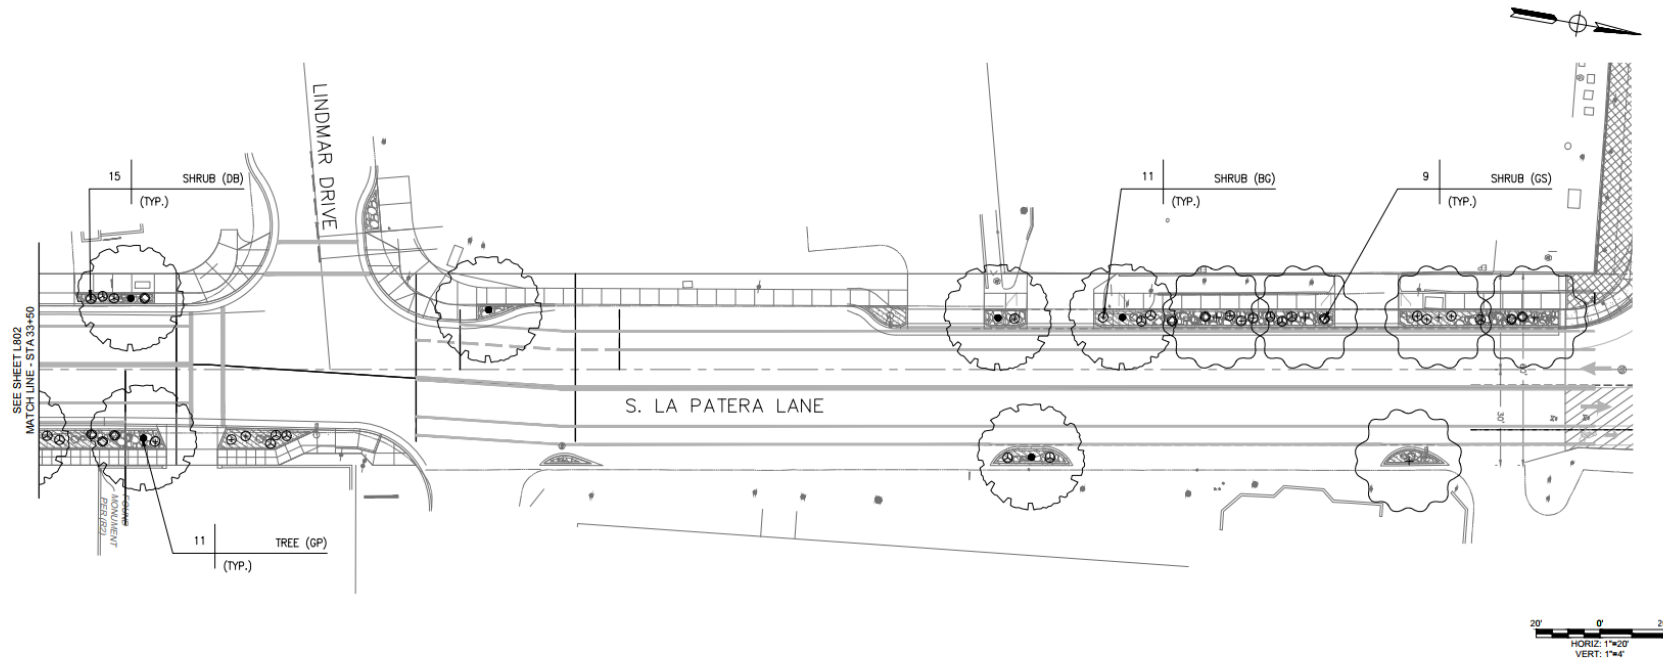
Proposed Site Plan – Northmost Portion of Project Site
